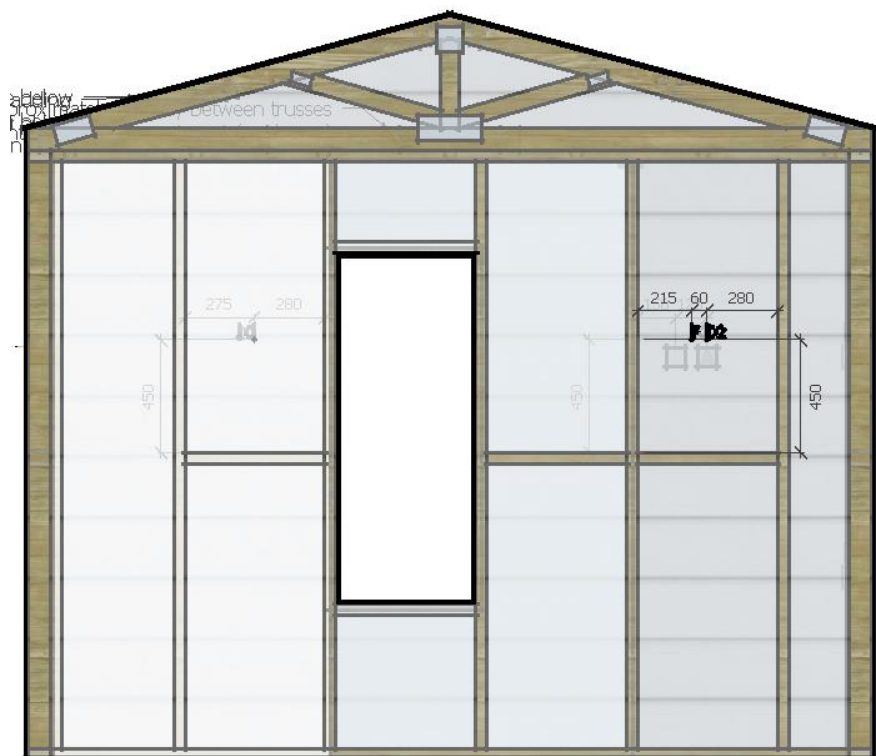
Experiment #2 general location of thermocouples on free end wall cladding (viewed from outside)
